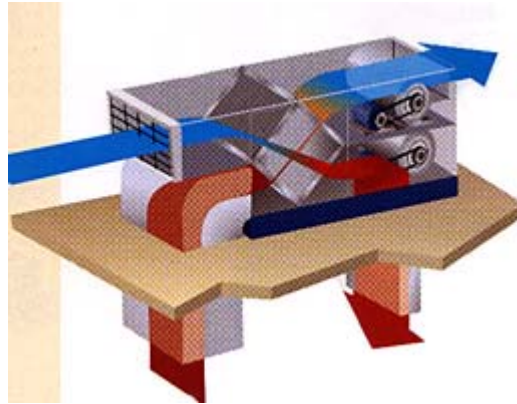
Example rooftop heat recovery unit for outdoor air handling.
